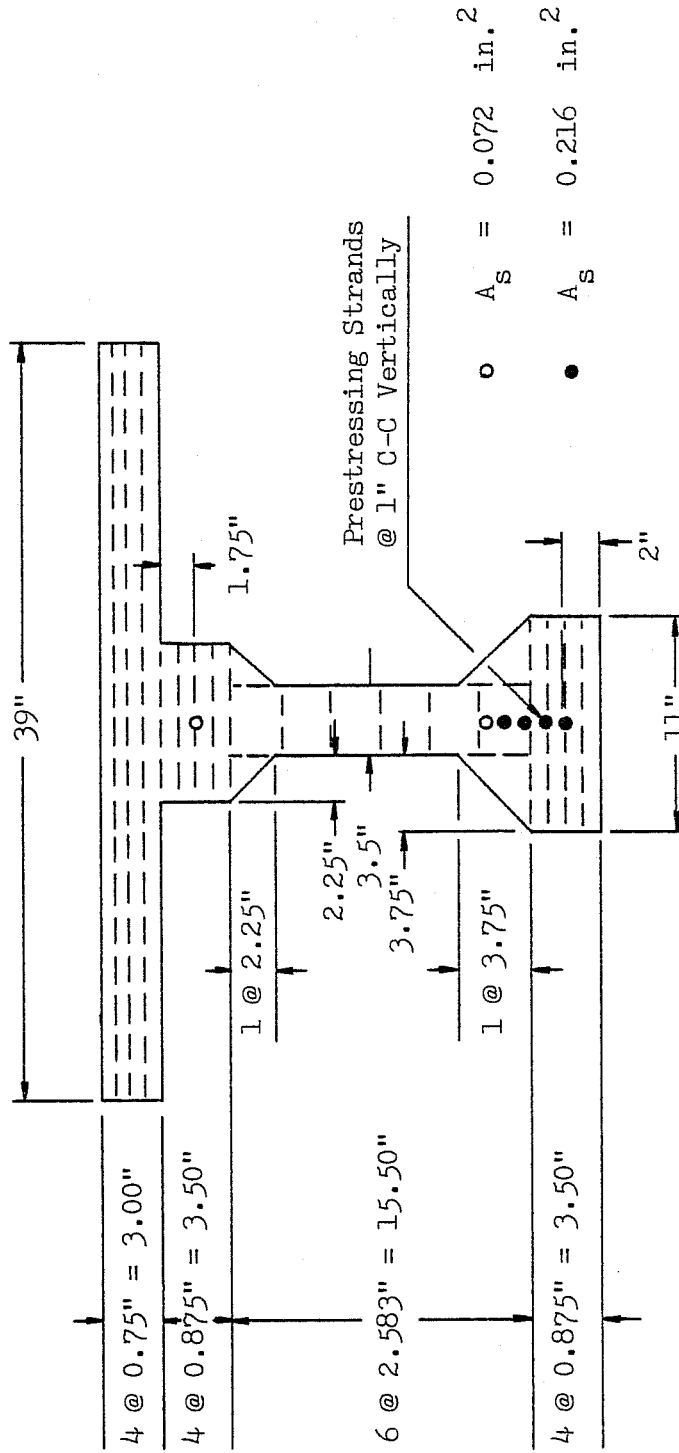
Modeled Cross-Section at Midspan for Girder 3/4.
